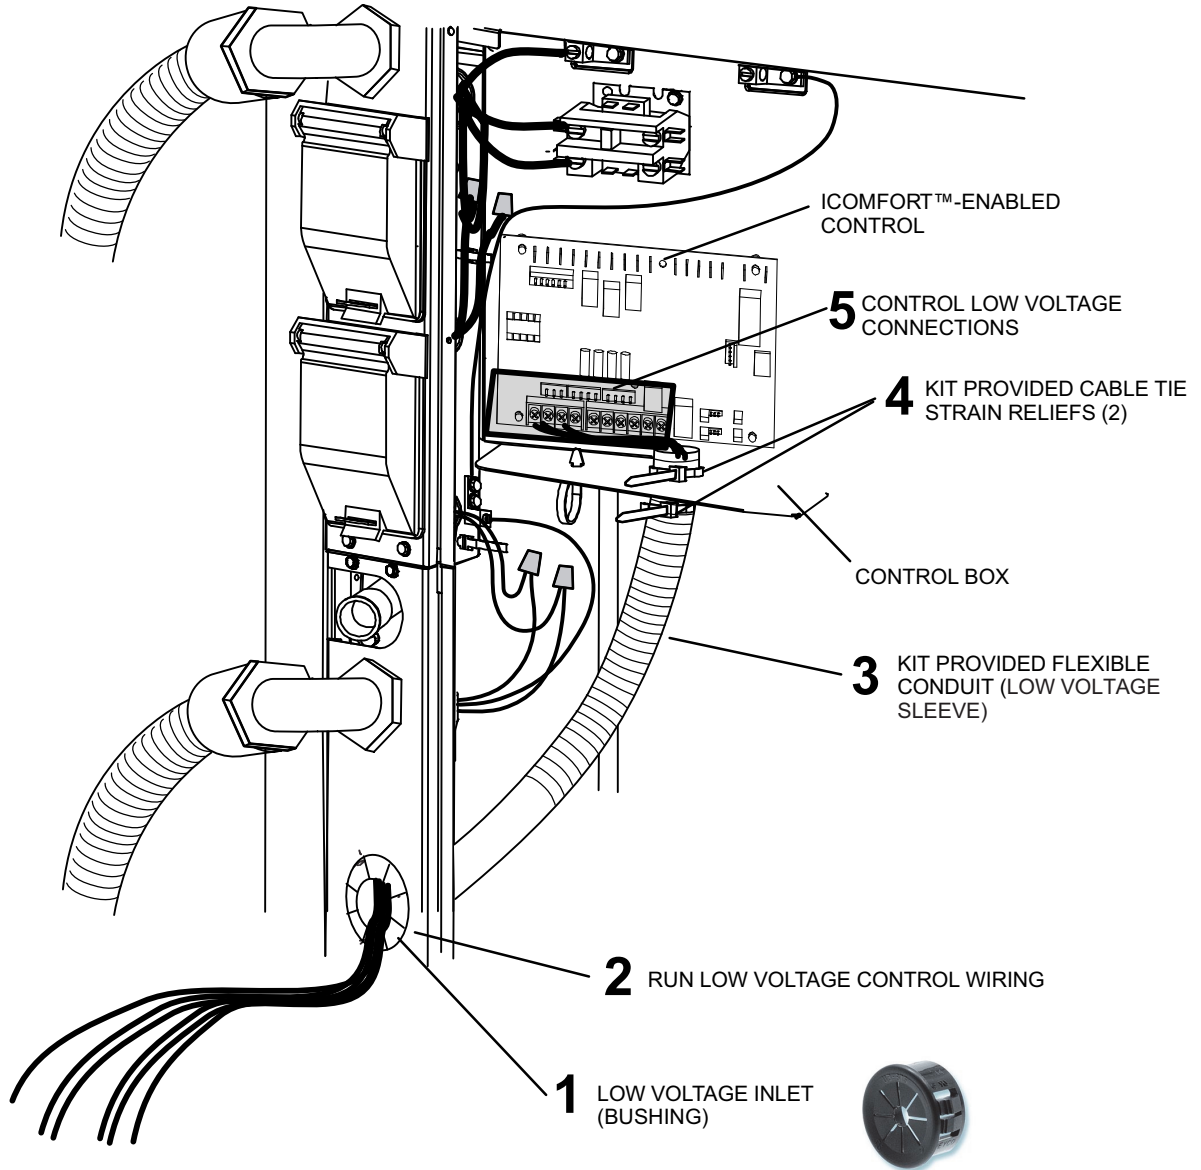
Typical Lower Solar Subpanel Low Voltage Wiring Connections
